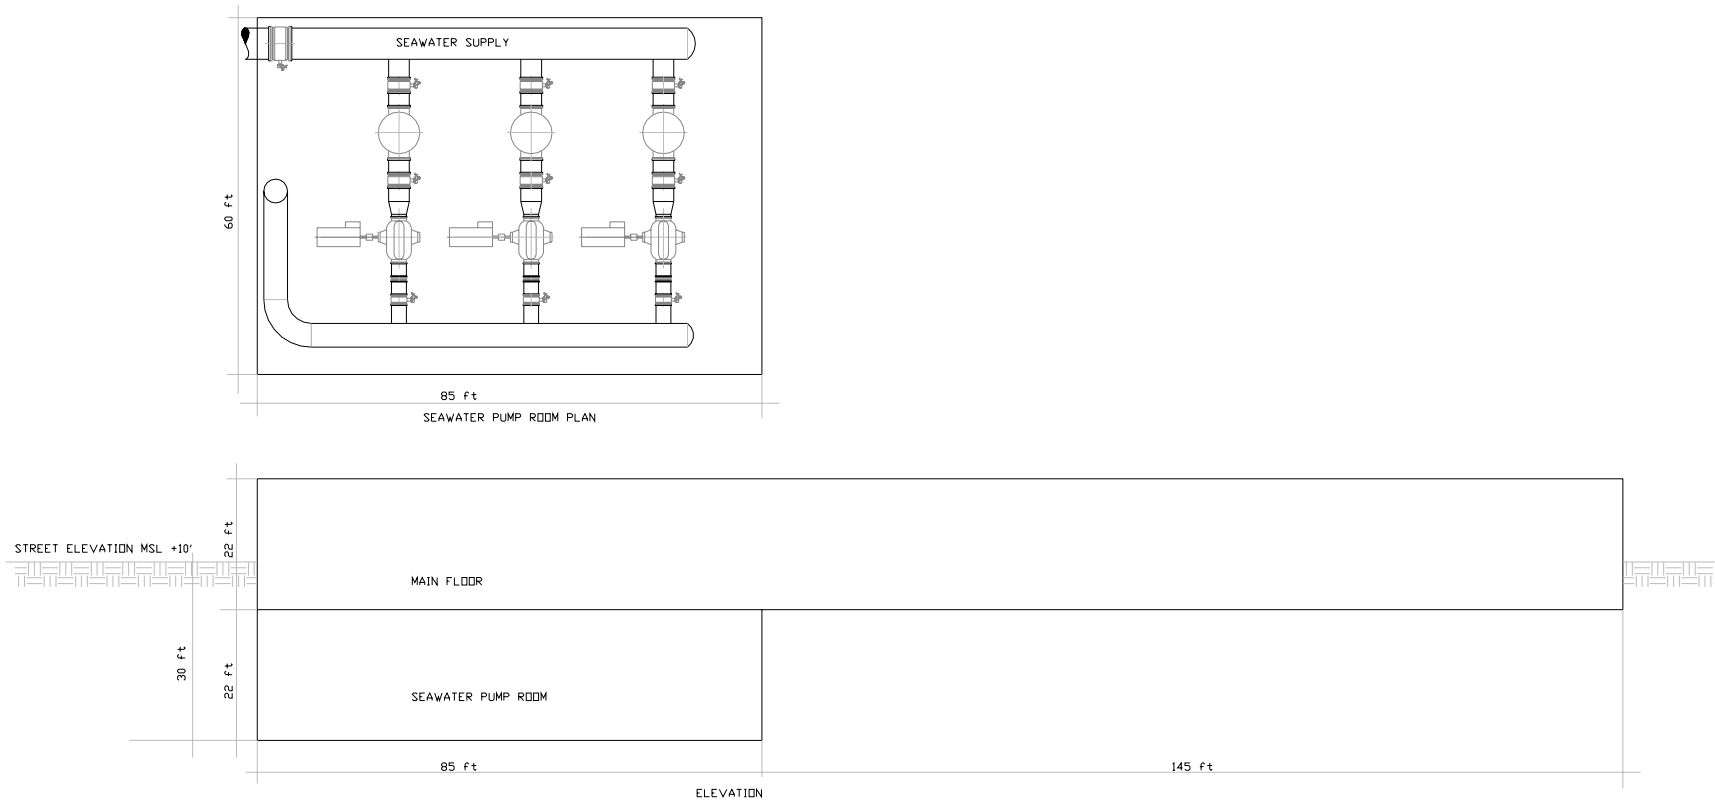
Cooling Station Seawater Pump Room Plan and Section
